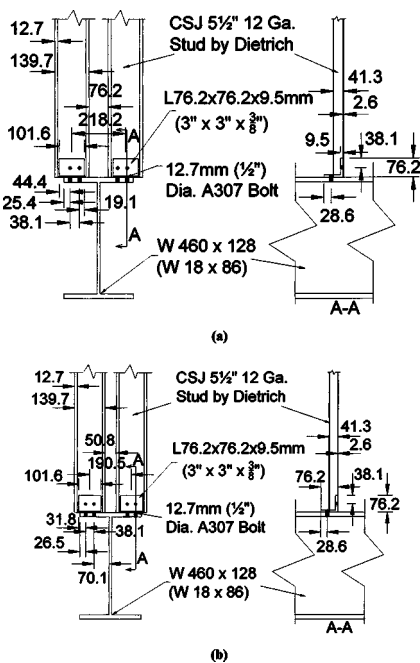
Cold-formed steel stud-to-beam connection details: (a) F1; and (b) F3
